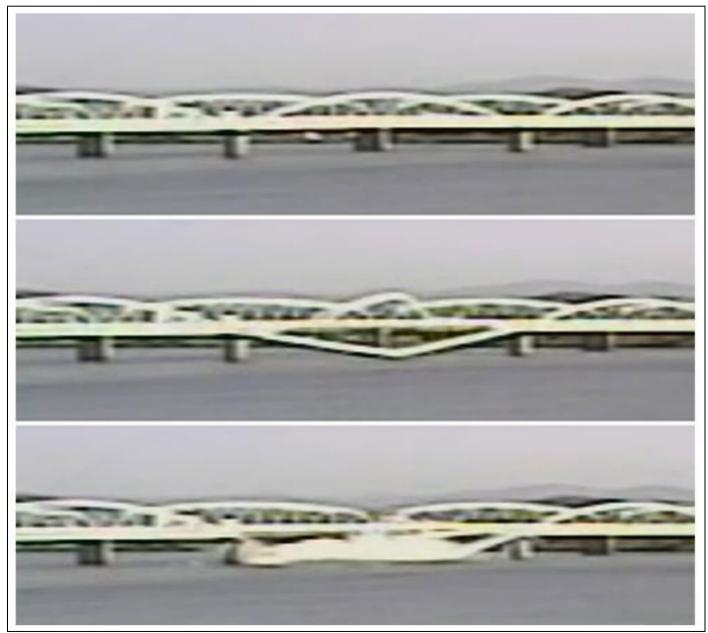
Wakayama Aqueduct Bridge Failure view of a Camera[8]
